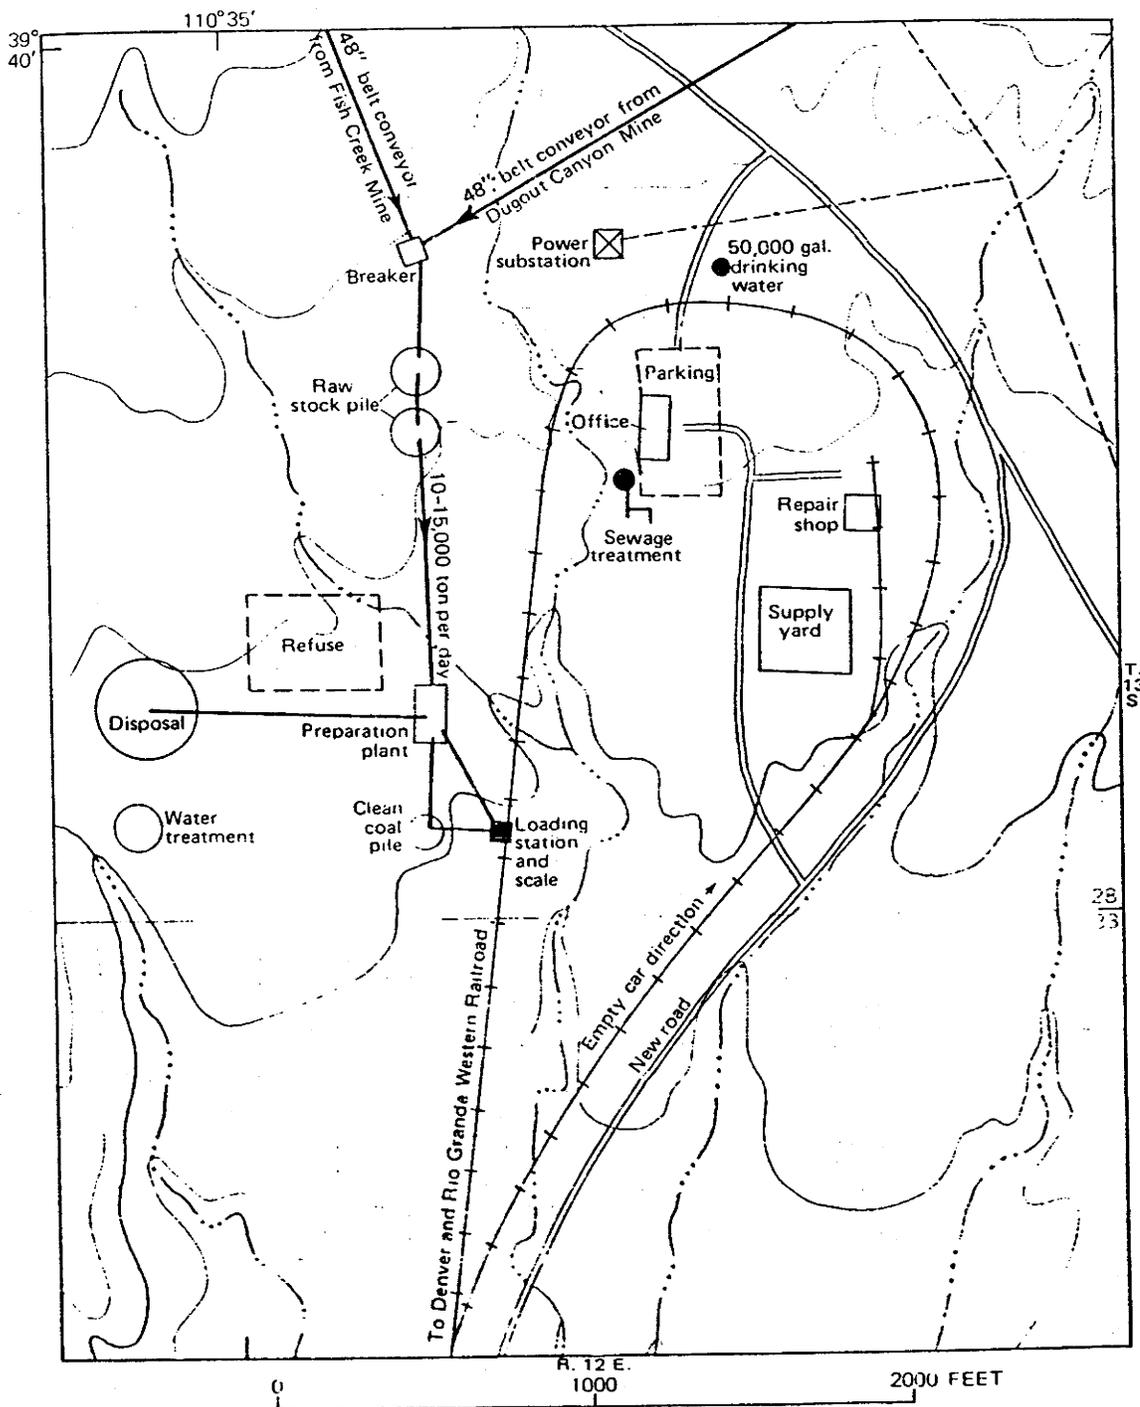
Proposed layout of the surface facilities at the central yardsite for the Fish Creek and Dugout Canyon mines, Carbon County, Utah.
